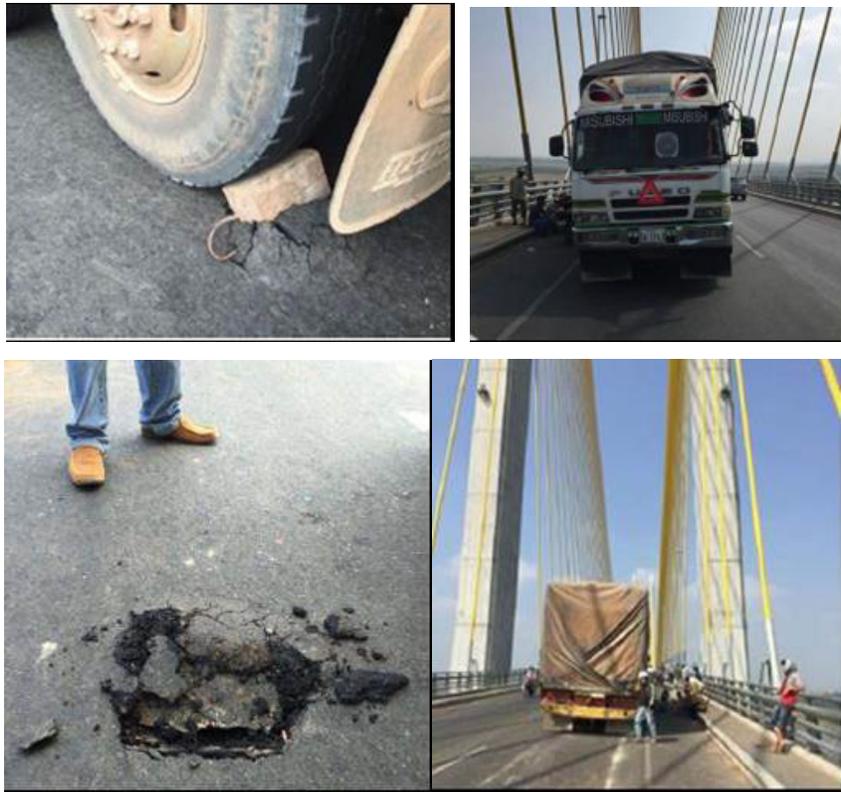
Damaged bridge Pavement due to overloaded vehicle
